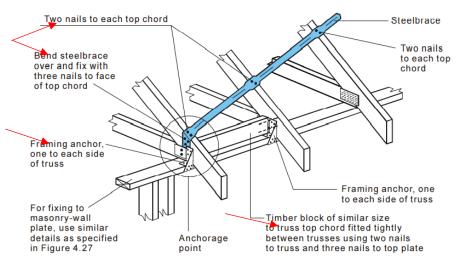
END FIXING DETAILS AT HEEL—TO TOP PLATE (ALTERNATIVE)
